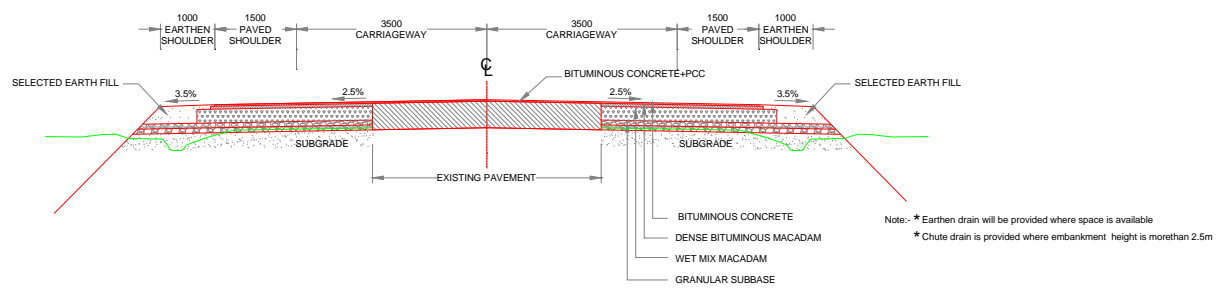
TYPICAL CROSS SECTION- TYPE-3
